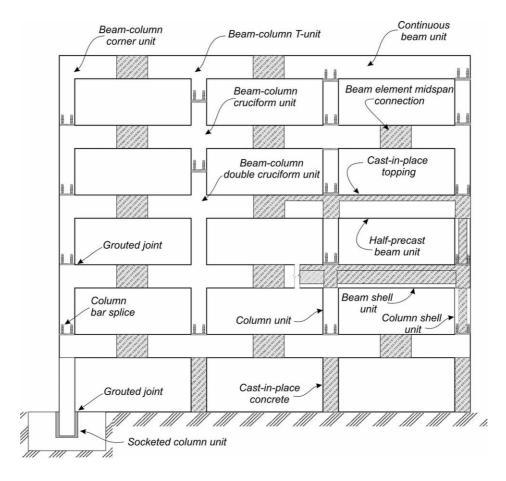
Common arrangement of elements, components and connections in precast concrete moment-resisting frame construction
